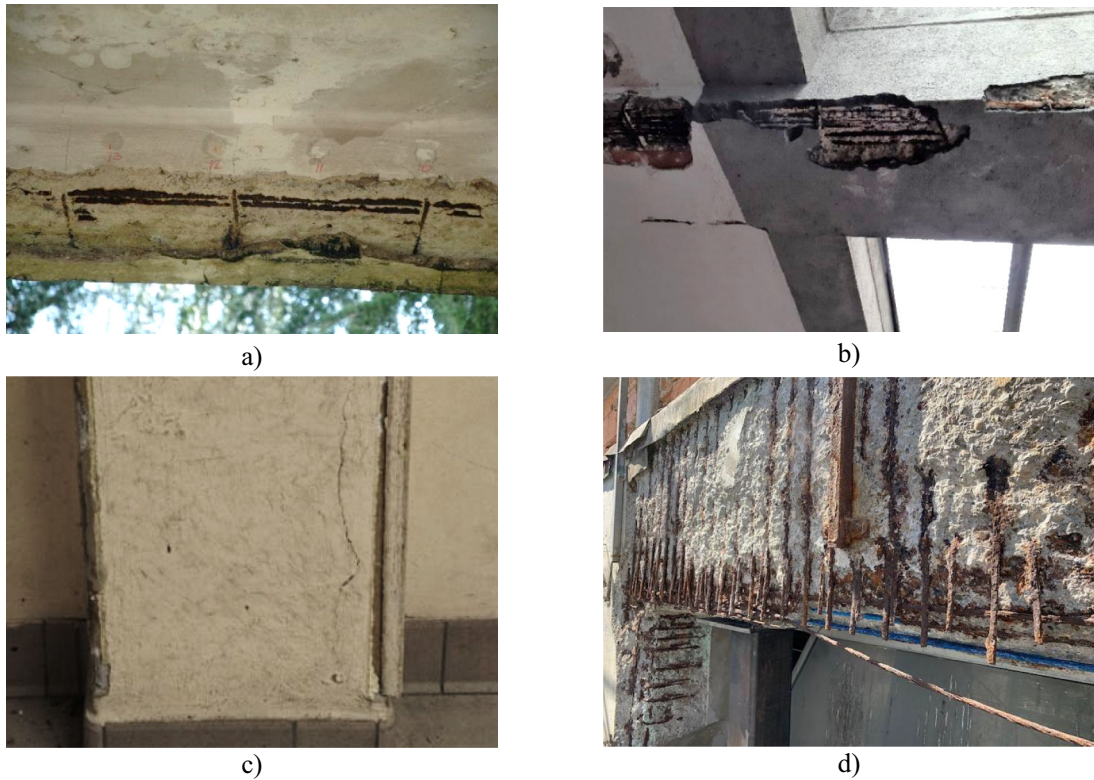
Visible damage detected in the structural elements of the investigated case study buildings: visible corrosion of the bars exposed after concrete delamination and spalling in the beam
